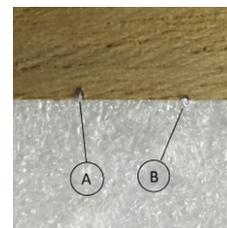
A. GALVANISED IRON CUT B. MILD STEEL CUT
